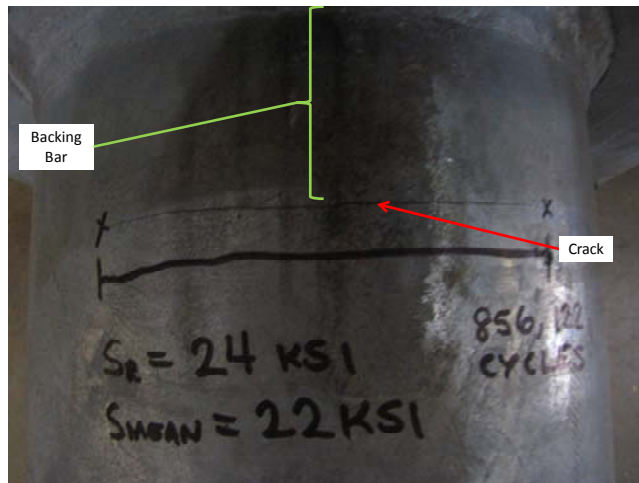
Typical Failure at a Backing Ring Fillet Weld
